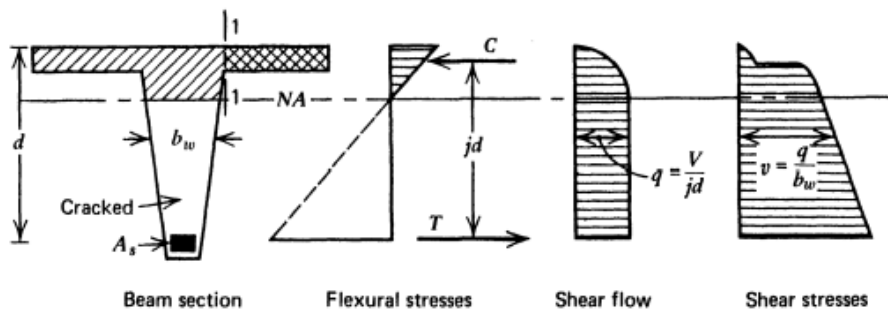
Shear stresses across an idealized cracked reinforced concrete section.
